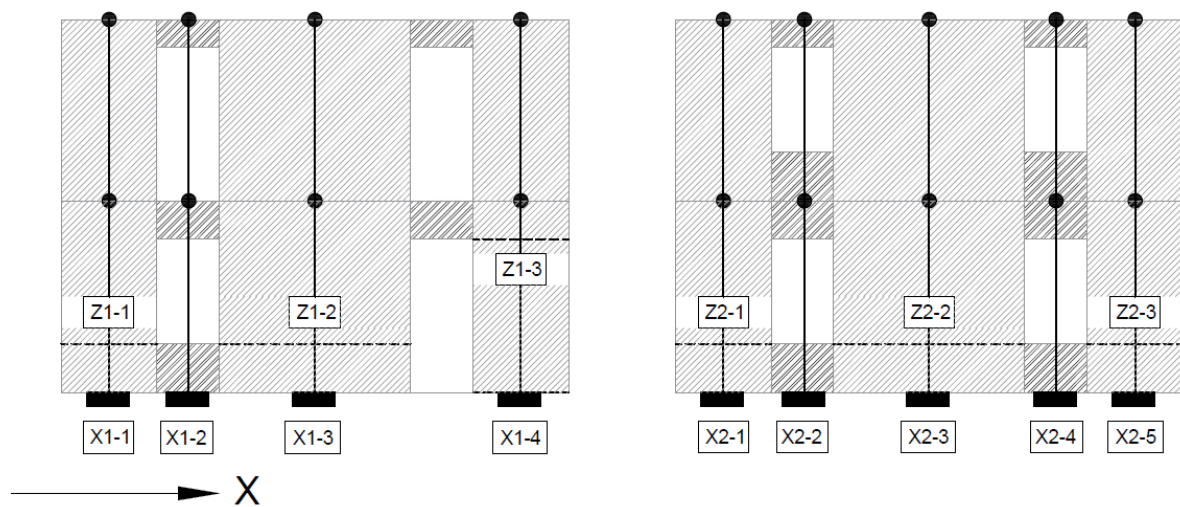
Piers arrangement for house WPL along X axis: door wall (left); window wall (right)
